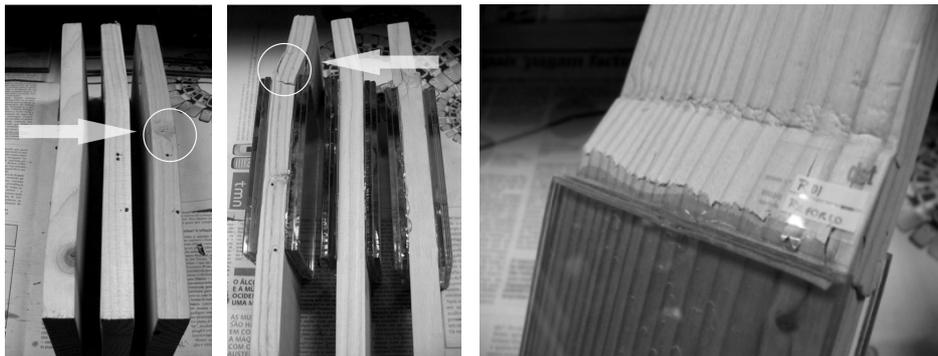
, b and c: Timber reinforcement with parallel glass plates – Tests 11.
